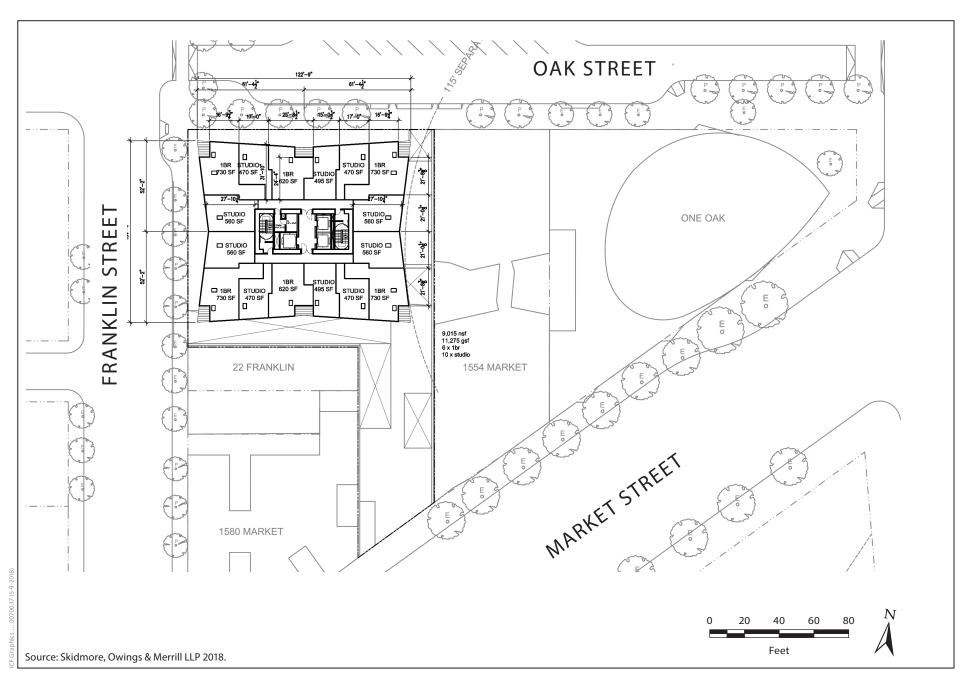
98 Franklin Street Project – Proposed Lower Tower Floor Plan
